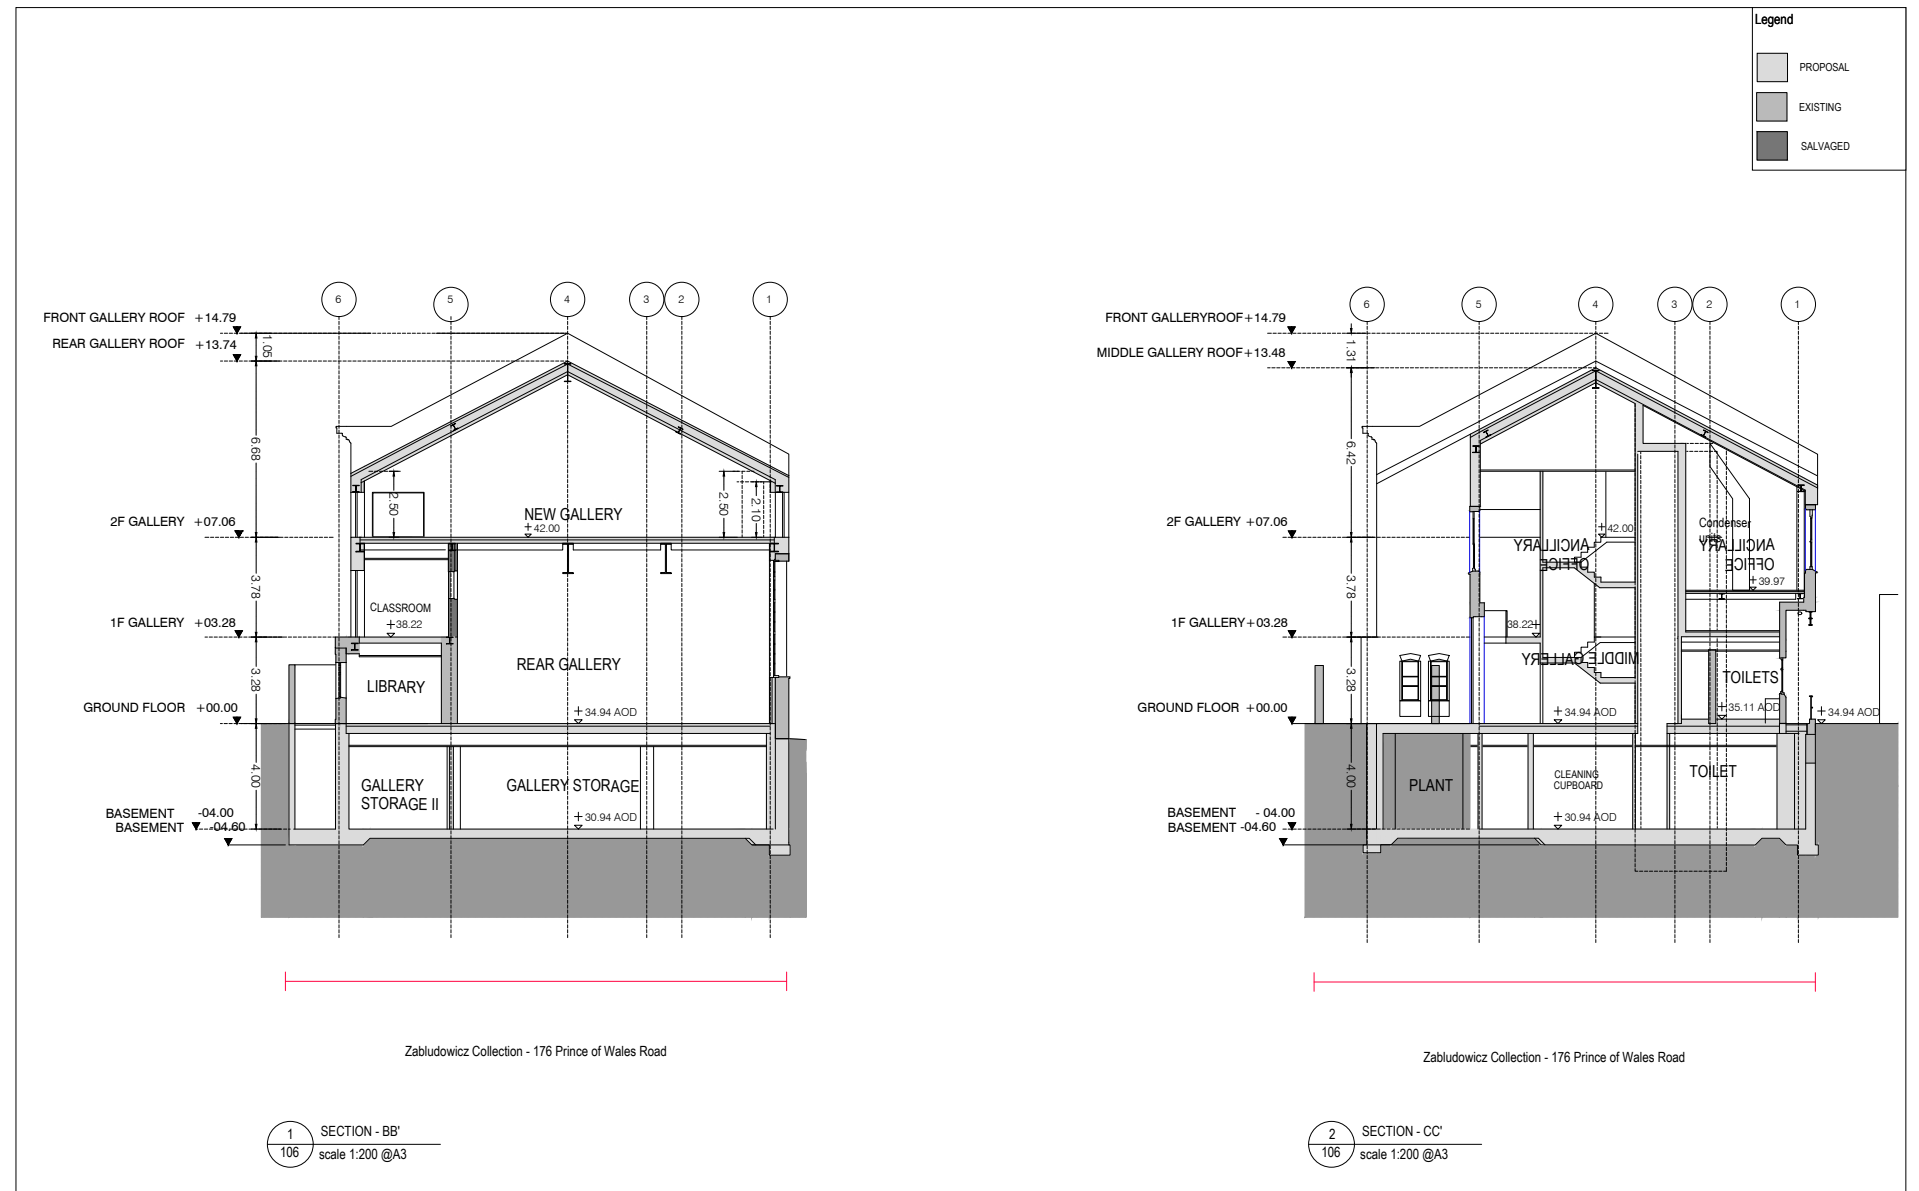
Proposed Sections BB' & CC' showing the roof height of the extension to the rear. Source: Farshid Moussavi Architecture.
